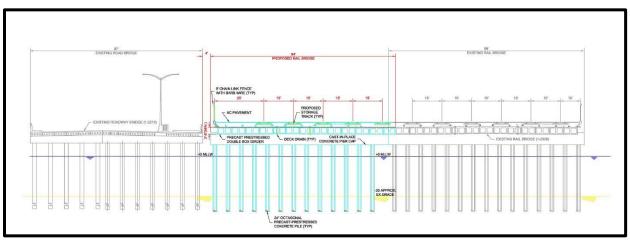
Rail Bridge Cross Section of Proposed Improvements
